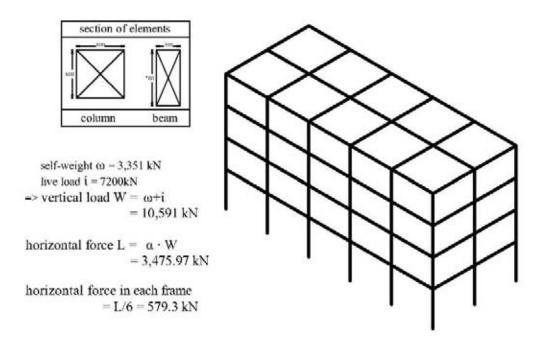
loading scheme of the construction model made of sawn wood
